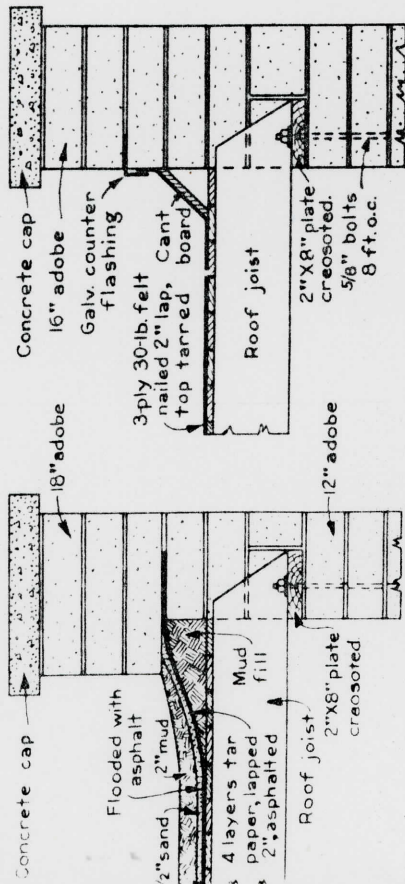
Two methods of building flat roofs on earth-block buildings.
